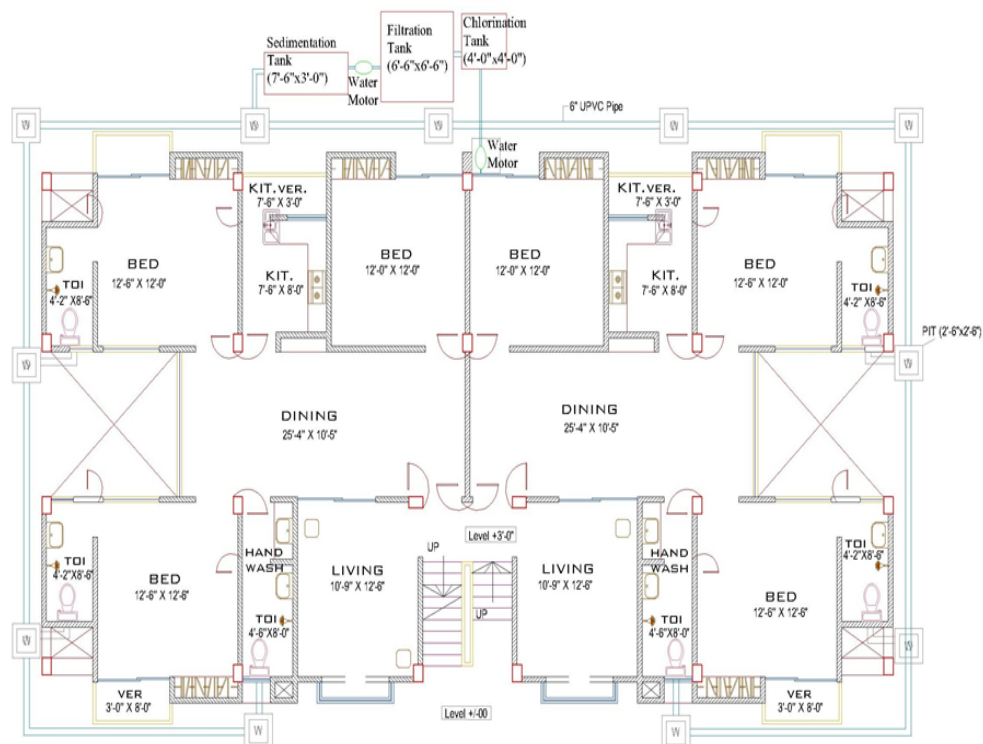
Implementation of grey water treatment system for a 5-storied residential building (Ground floor plan)
